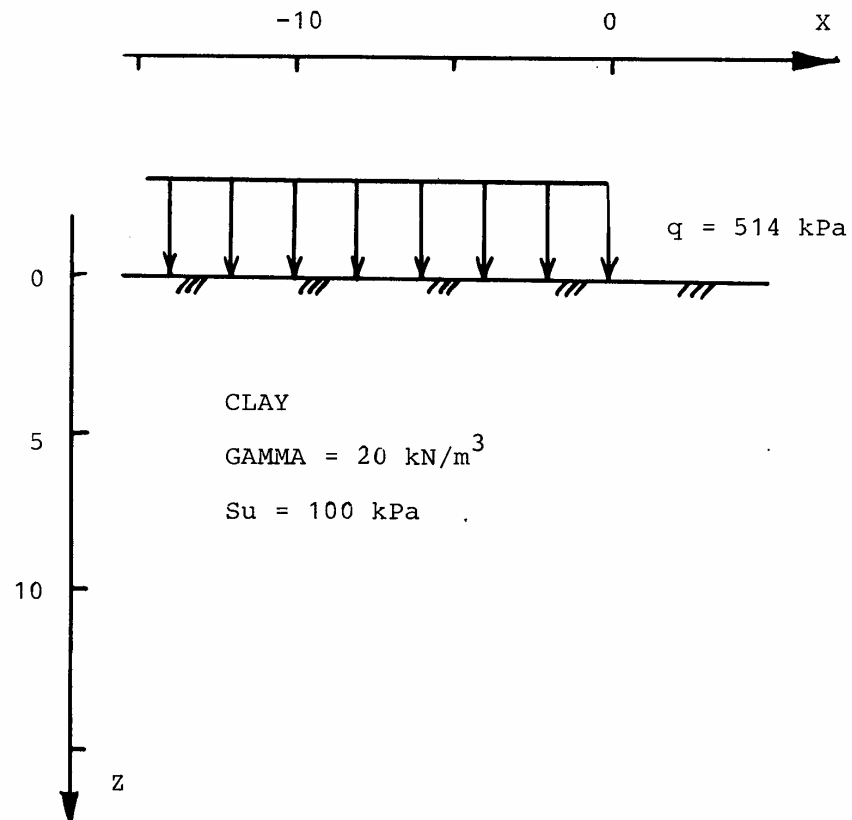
Test Example 1, Strip Loading on Clay
